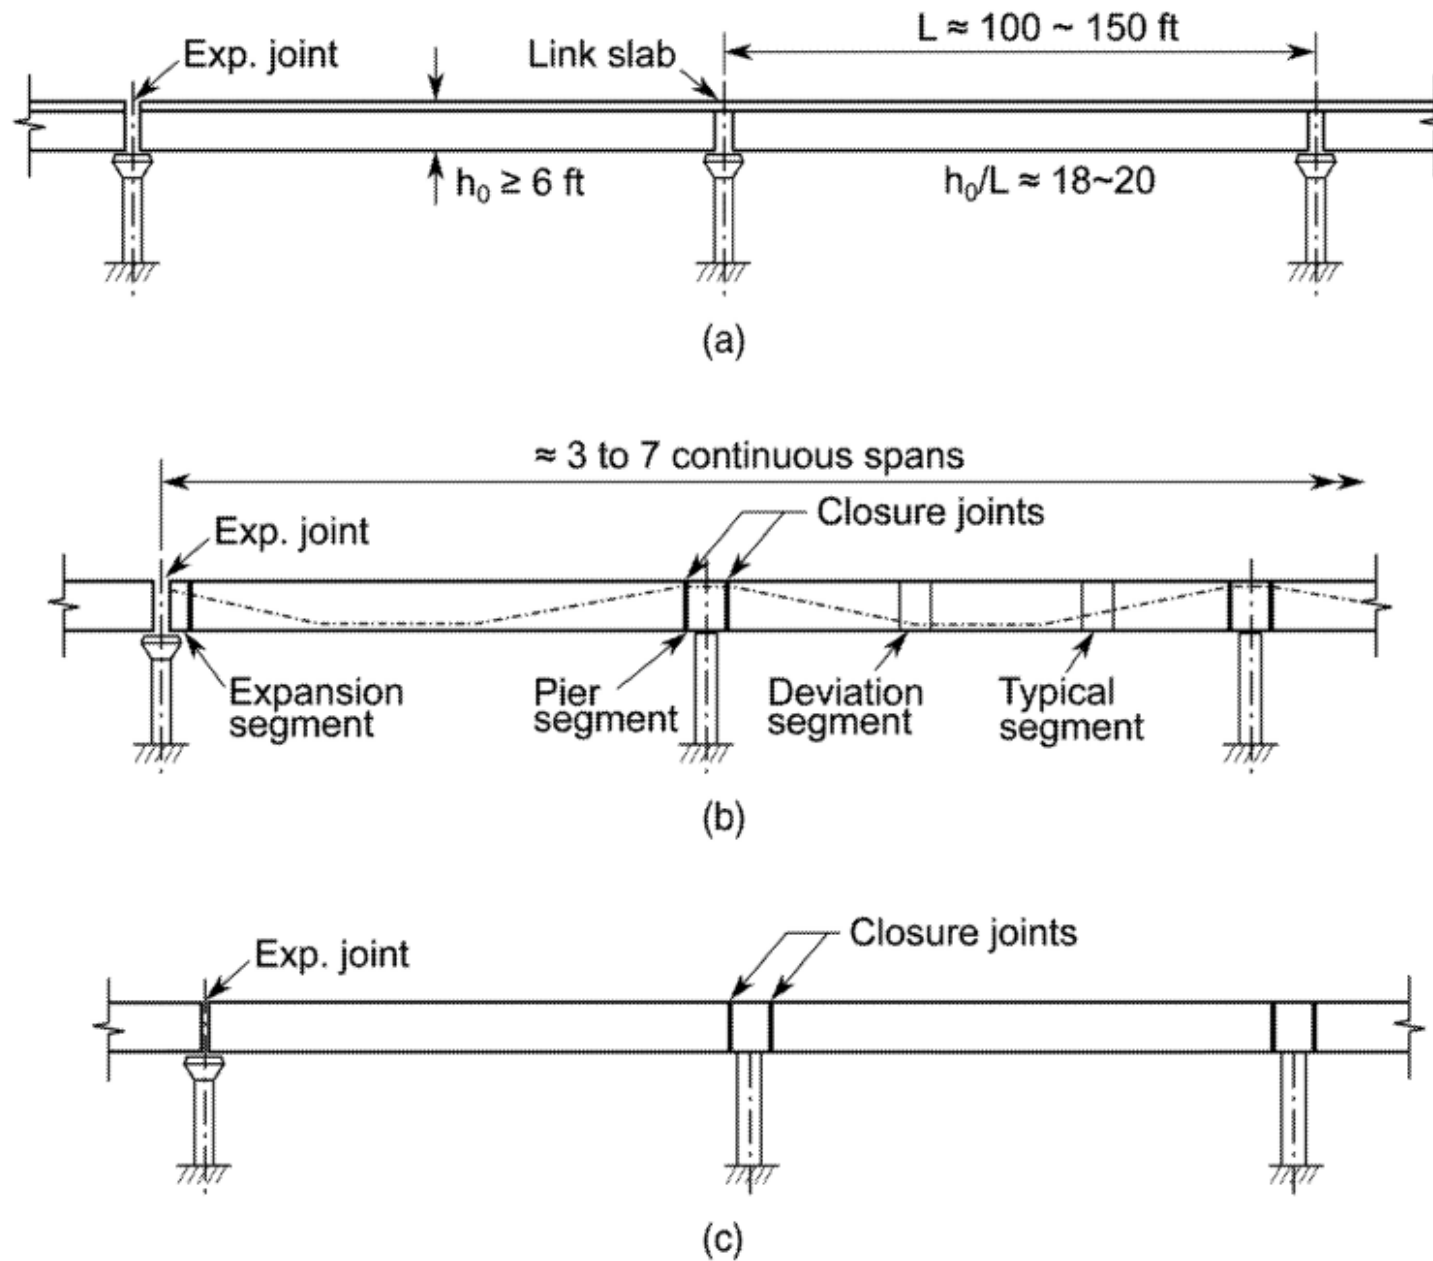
Span Layout, (a) Simple Span, (b) Typical Continuous Spans, (c) Continuous Spans with Fixed Super-Structure–Pier Connections.
